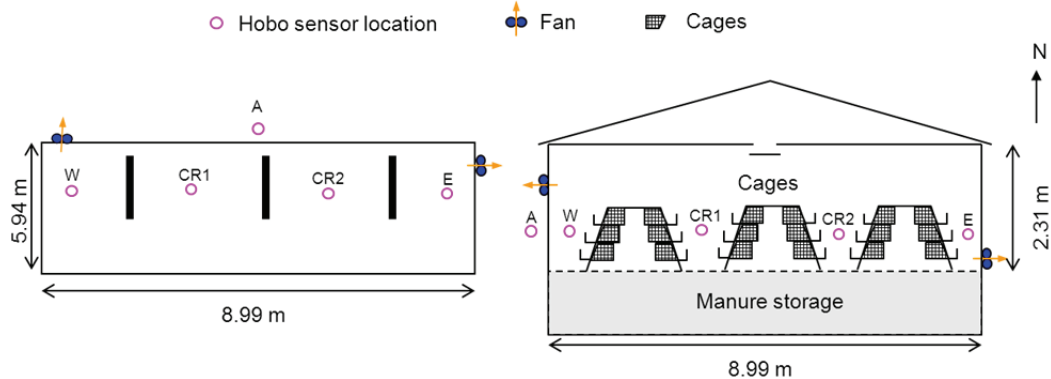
Schematic of the research building showing (left) the floor plan and (right) a cross-sectional view with the Hobo sensor locations: A = ambient, W = west side, CR1 = center row 1, CR2 = center row 2, and E = east side (not to scale).
